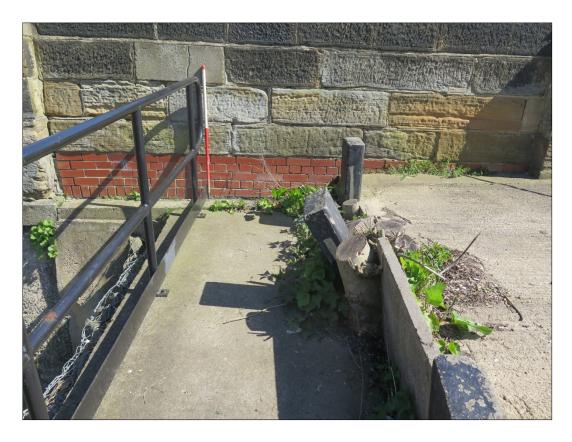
South-western elevation, detail of modern brick repair below parapet between piers 2 and 3, looking north-east
